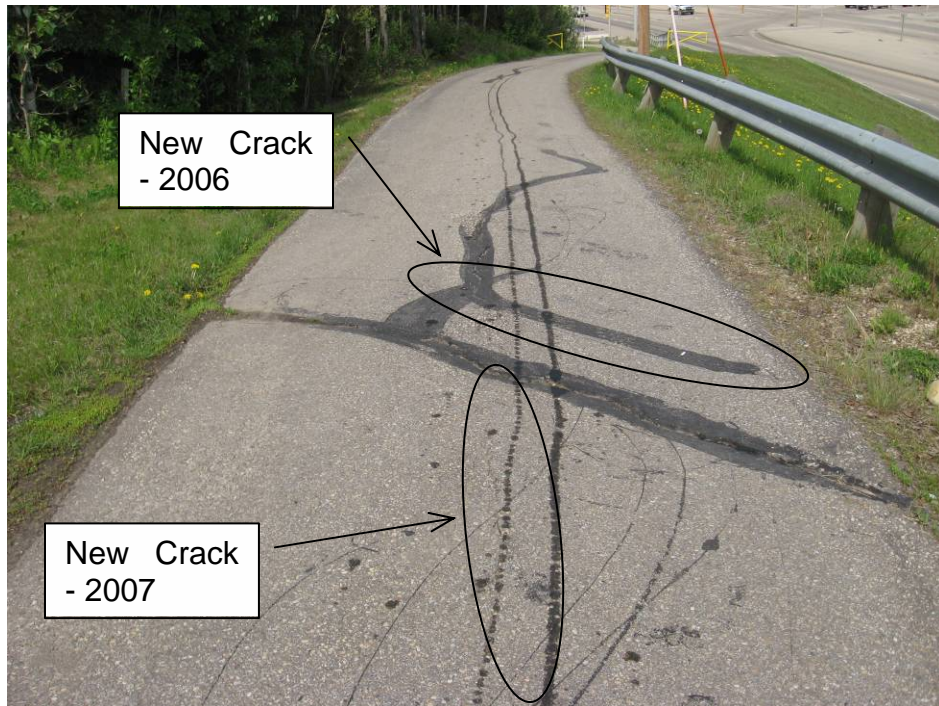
Closer view of new crack to between existing cracks, June 11, 2008.
